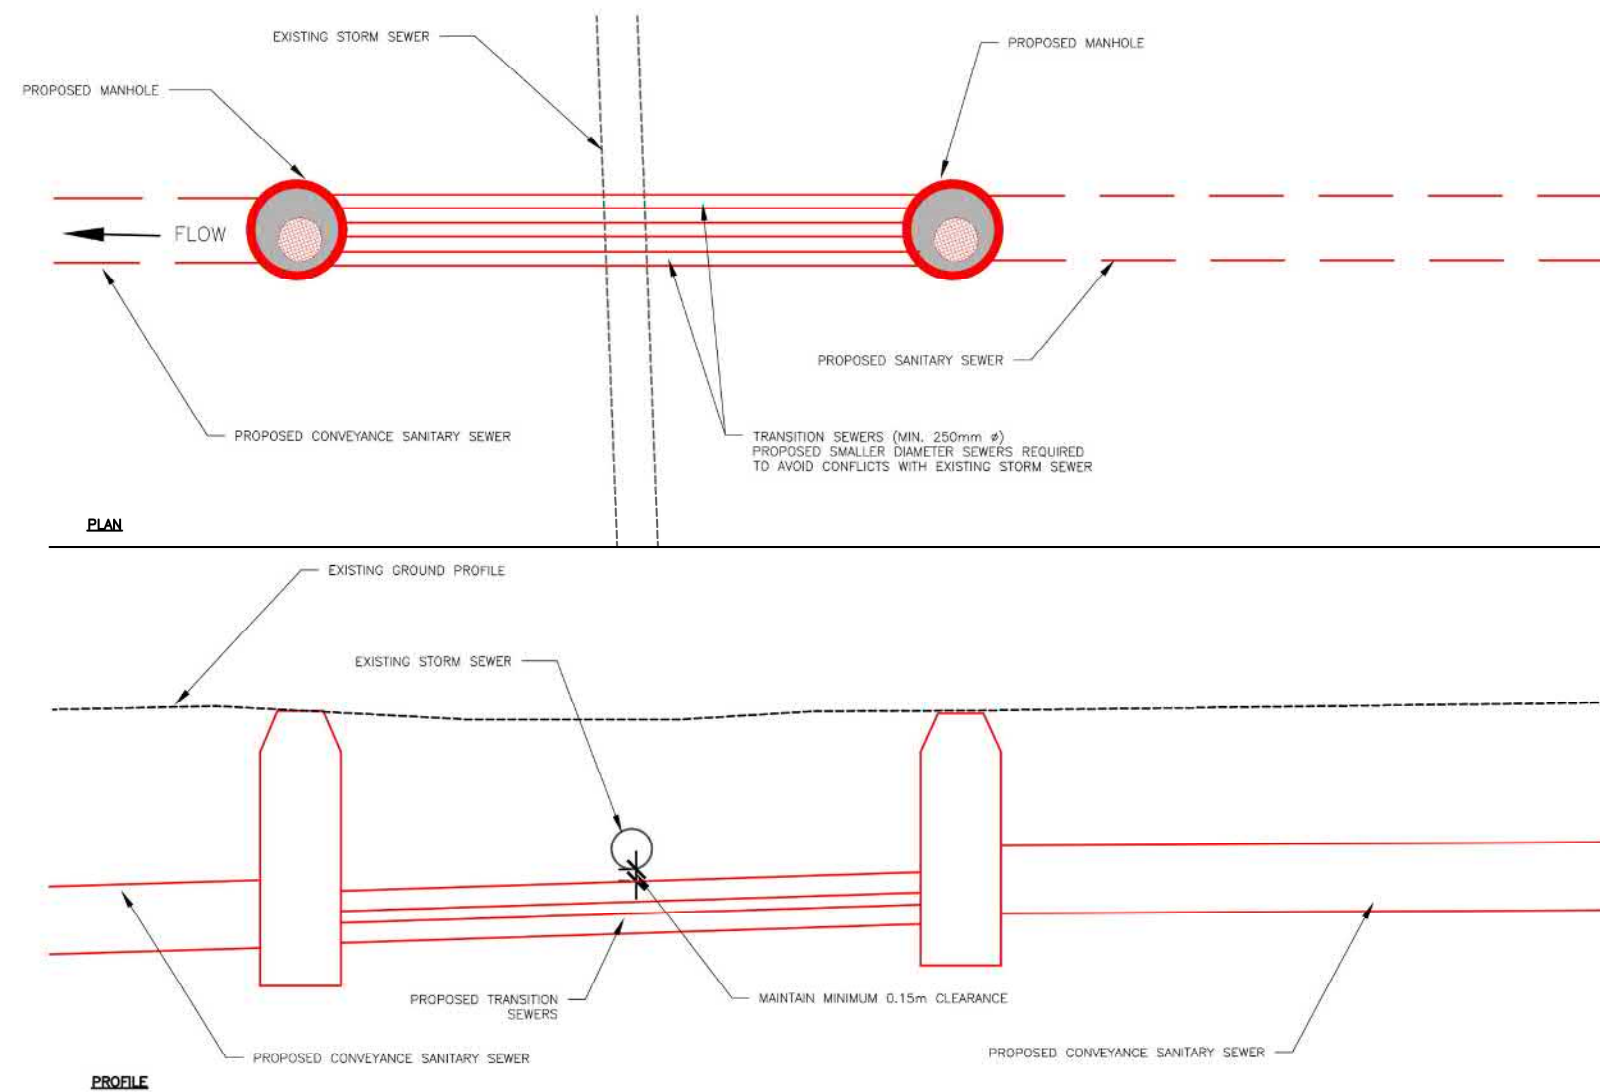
Transition Detail for Proposed Storage (Typical Detail #2)
